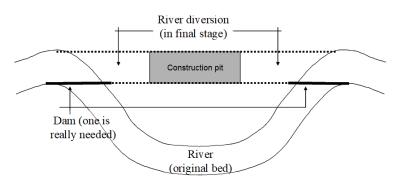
Pit outside the watercourse and (later) diversion to connect the lock
